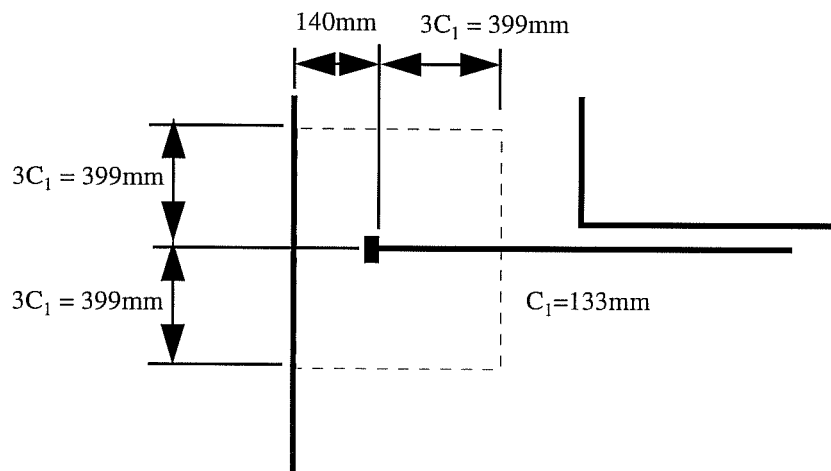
Blowout Failure for Beam-Column Joint Design Example
